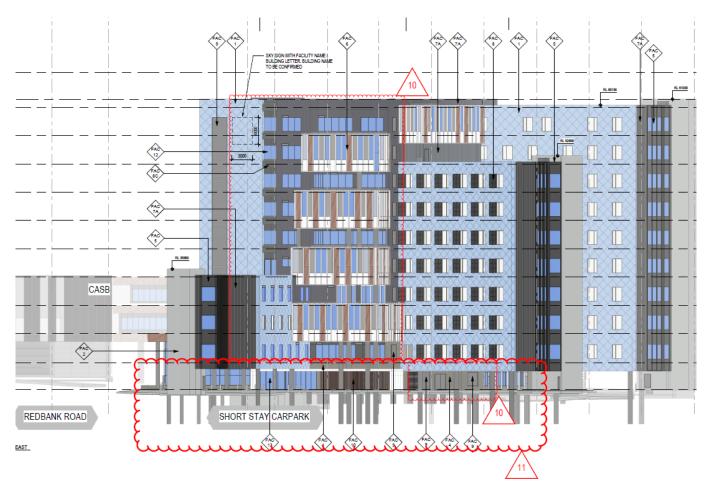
Modification 3 - Eastern Elevation - Addition of mechanical louvers labelled as '10'
